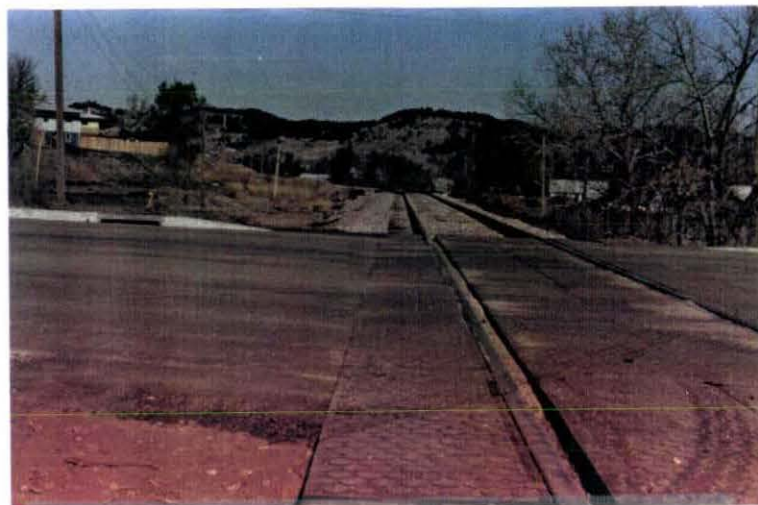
Sturgis, Ball Park Road - Crossing One Month after Completion.
